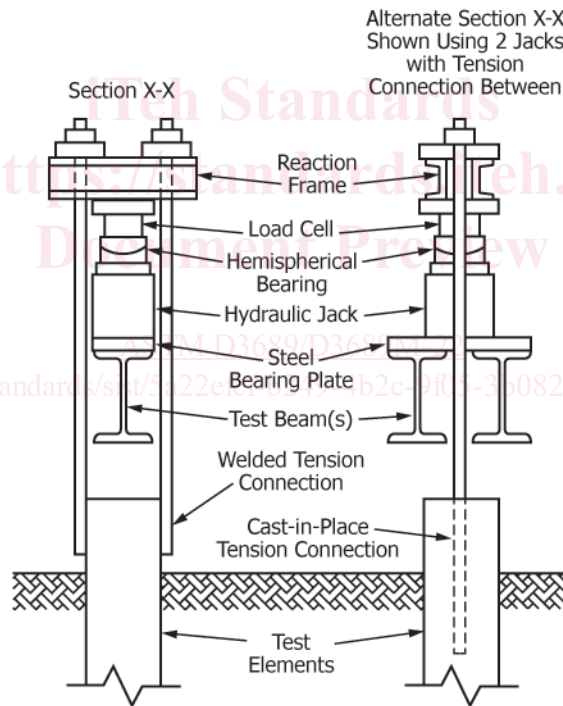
Typical Section X-X (Fig. 2) of Test Beam(s) at Test Pile Element(s)
